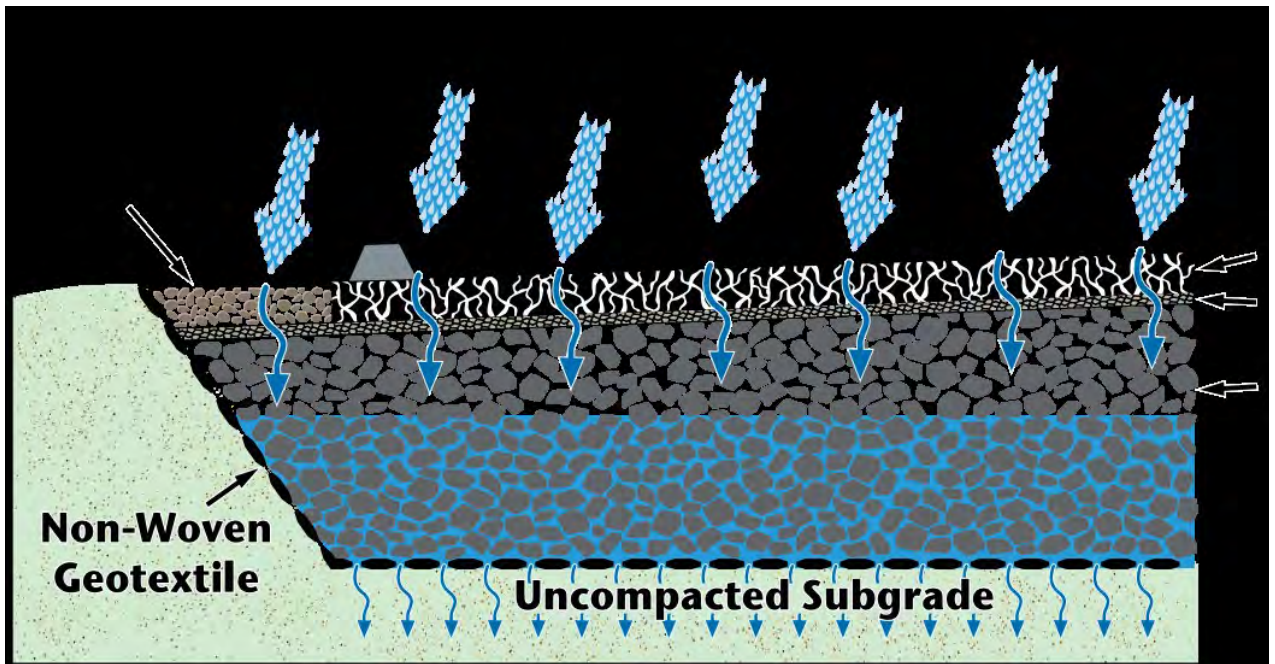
, A diagram of the structure of a porous asphalt trail. (Porous Asphalt Pavements 3)
